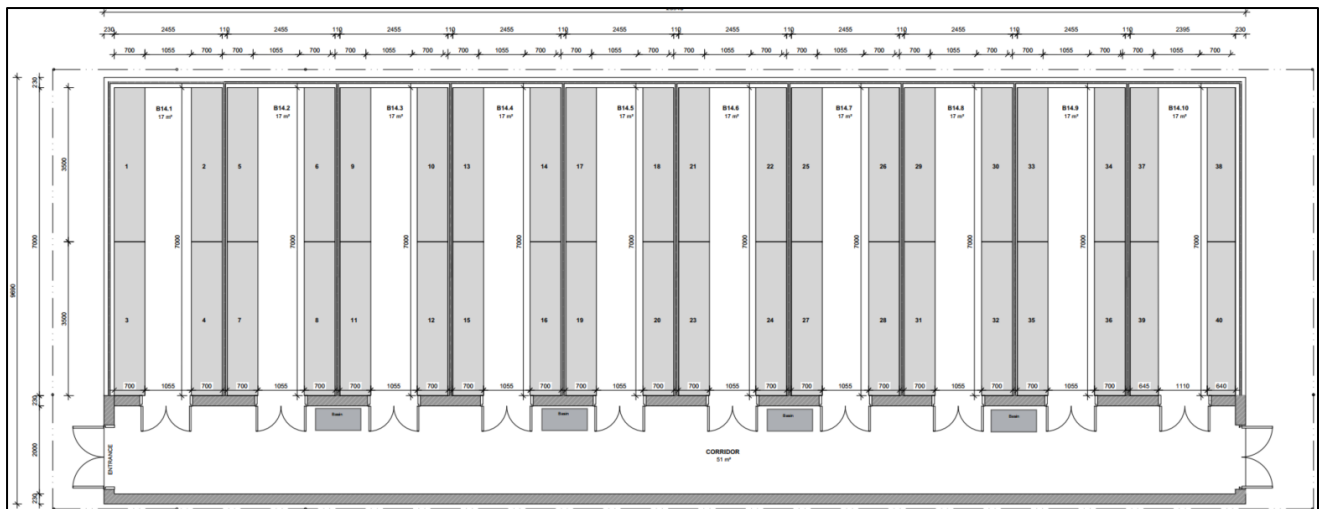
BASIC LAYOUT OR B14 GREENHOUSE (SEE ADDENDUM A DRAWINGS)
